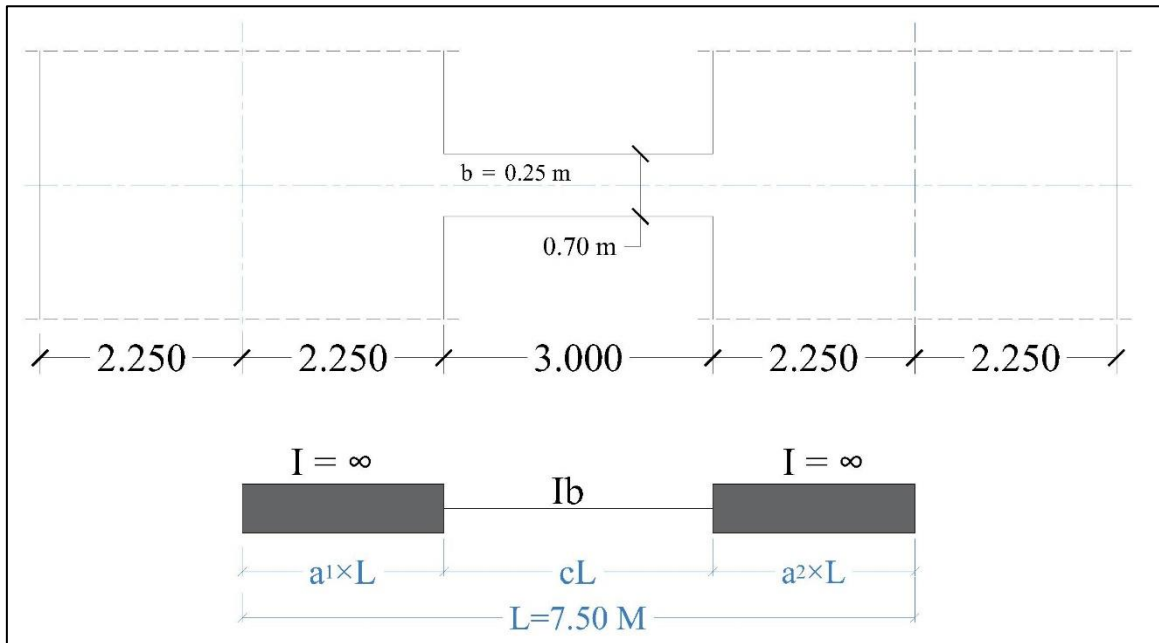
Coupled Beams Connected Between Two Shear Walls (Right and Left) (Y-Dir.).
